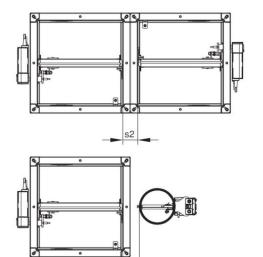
Fire batt – Installation of two fire dampers in a solid wall, lightweight partition wall or timber stud wall
